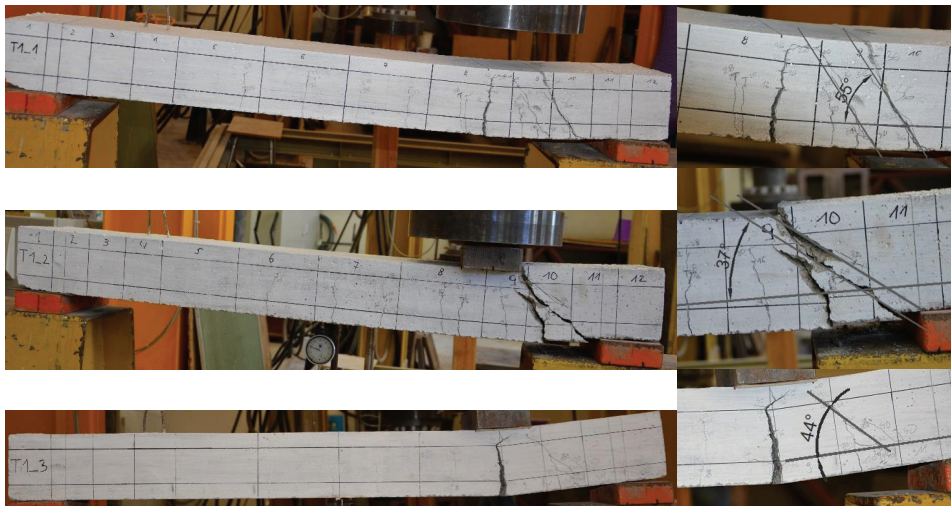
Form of lintels failure: L1, L2, and L3
